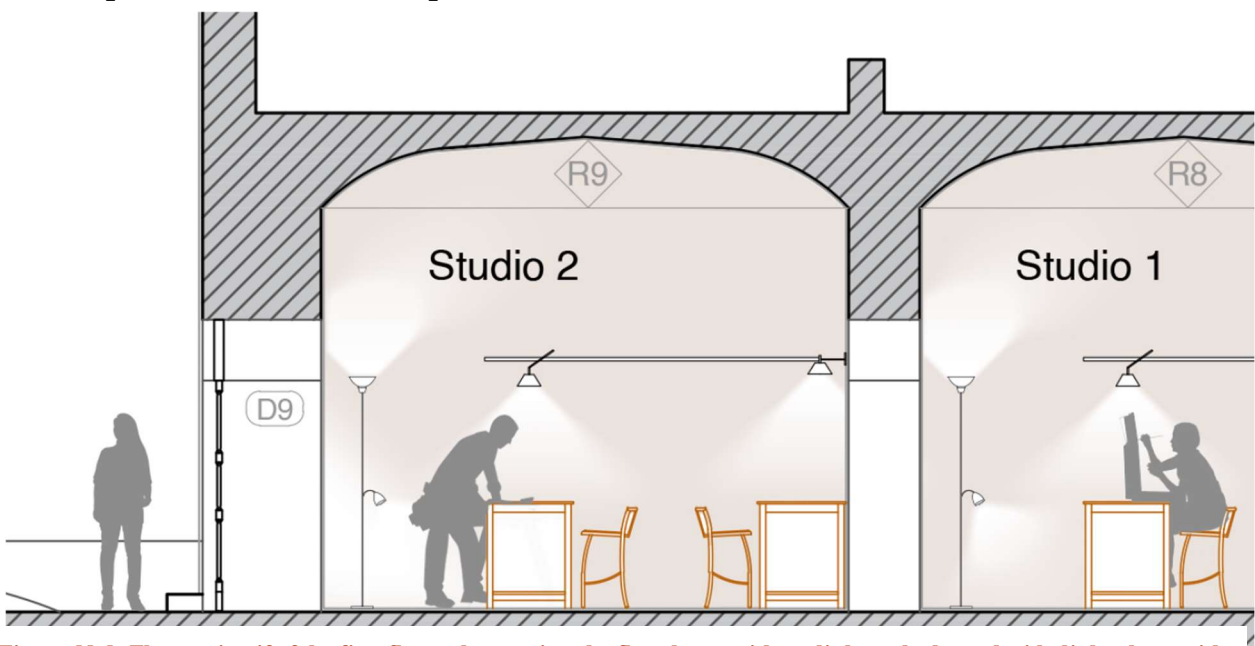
The section if of the first floor, showcasing the floor lamp with up-light and a branch side light along with track light installation. The track lights light up the working area prominently.
